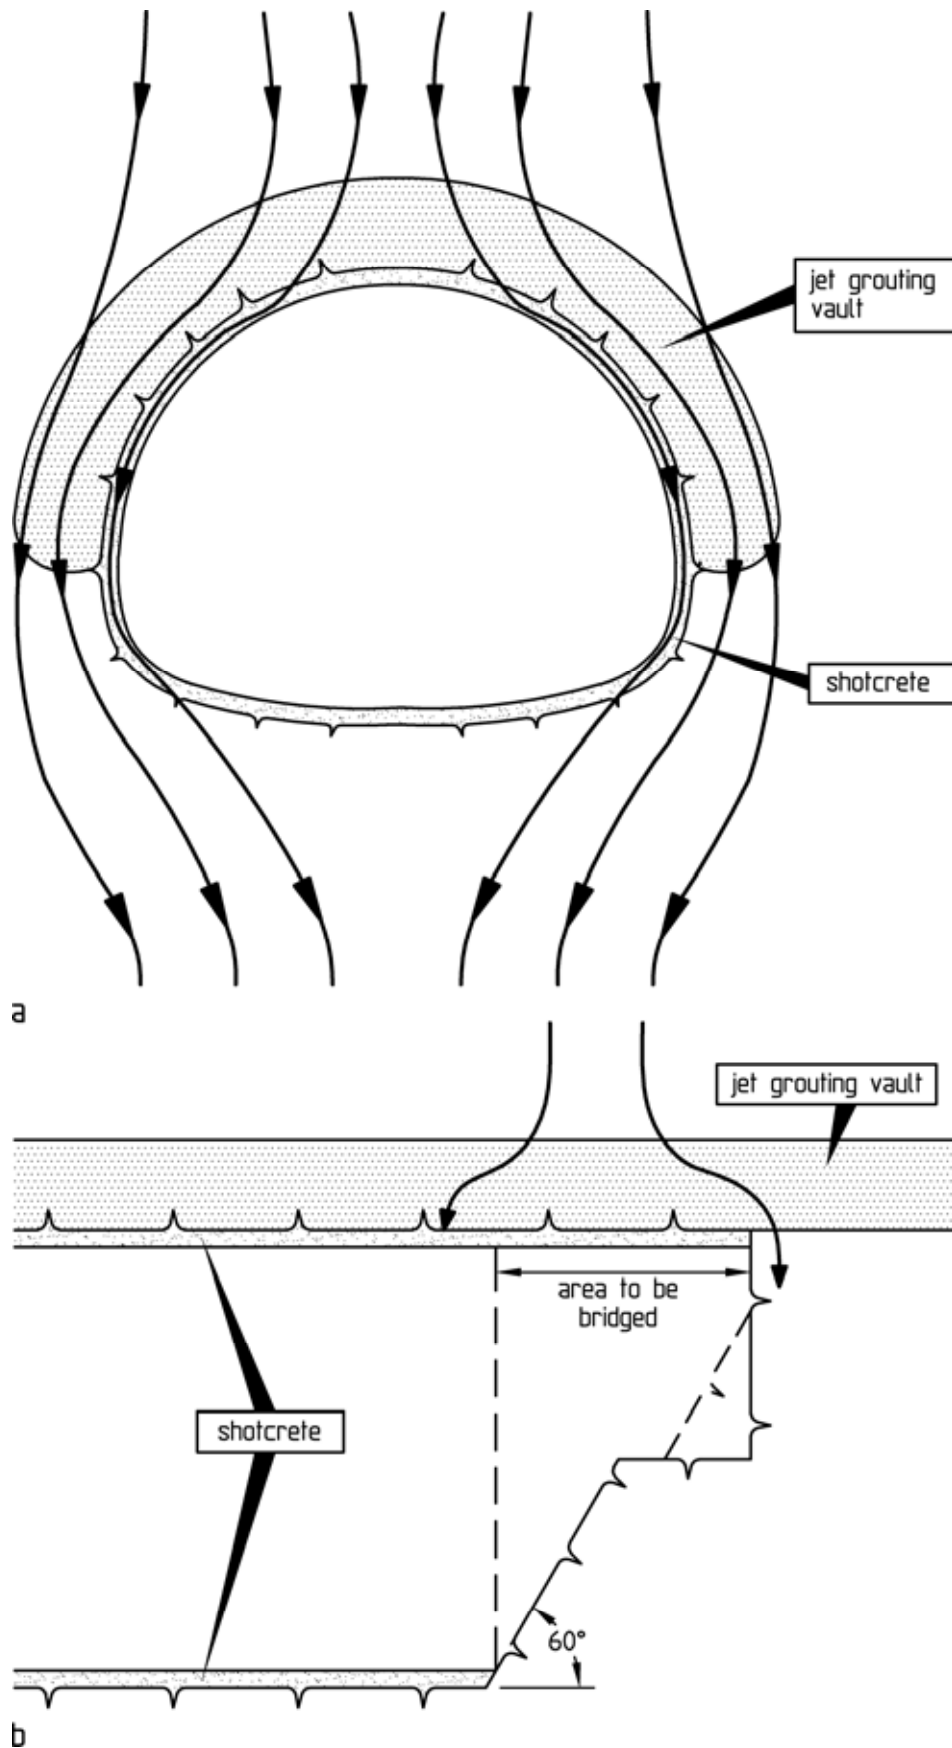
Load transfer by the jet grouting vault and the shotcrete membrane: a) Cross-section; b) longitudinal section
